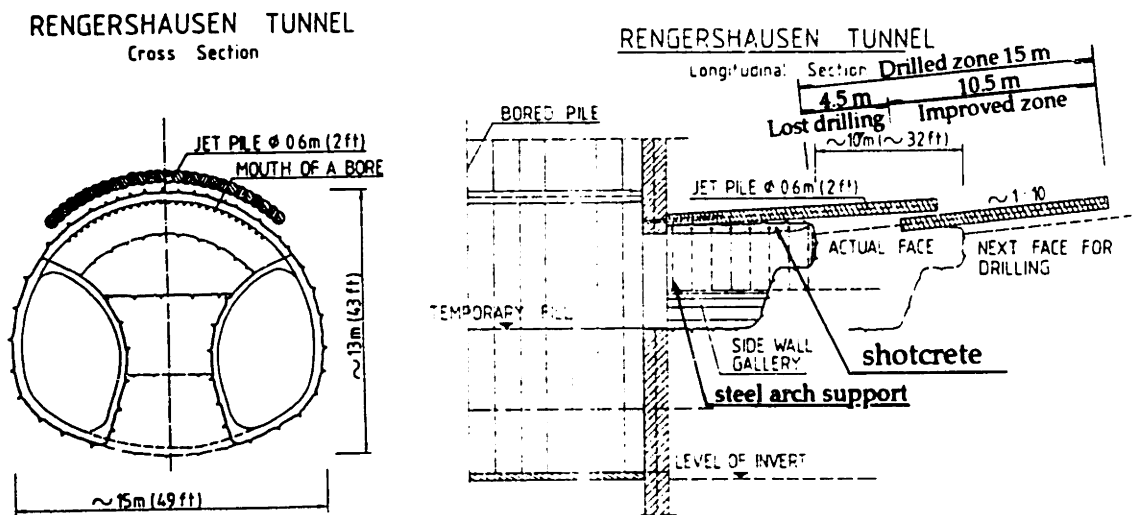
Cross and longitudinal sections: Rengershausen Tunnel (Mussger et al., 1987)
